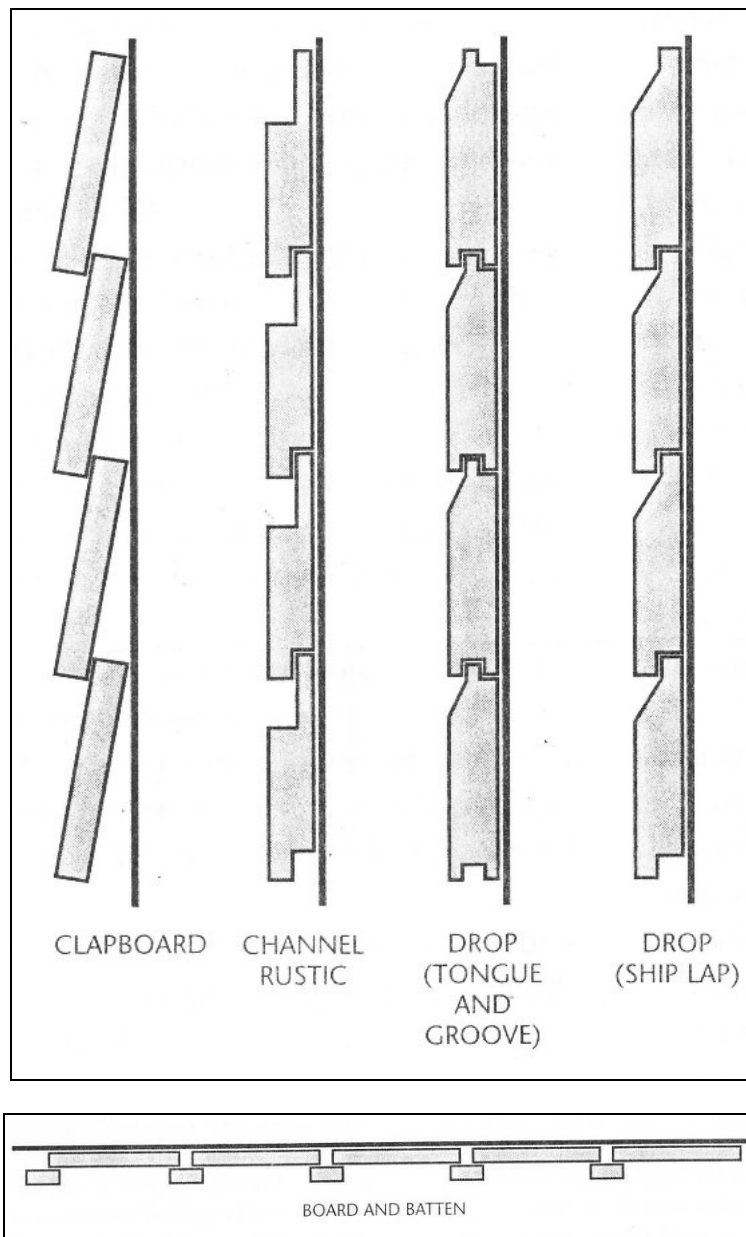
Examples of siding found in Freestone (Source: *Architectural Surfaces*)
